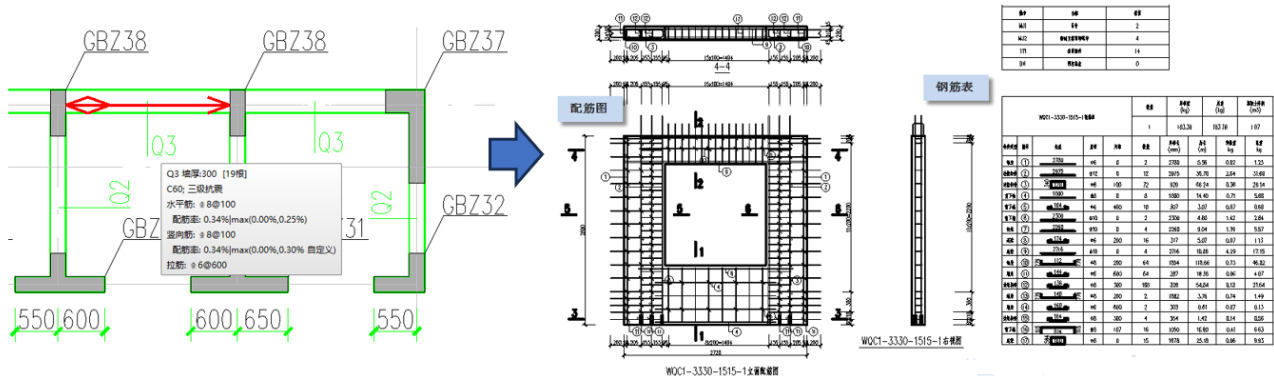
Prefabricated wall reinforcement obtaining process in YJK's built-in prefabricated building design software
